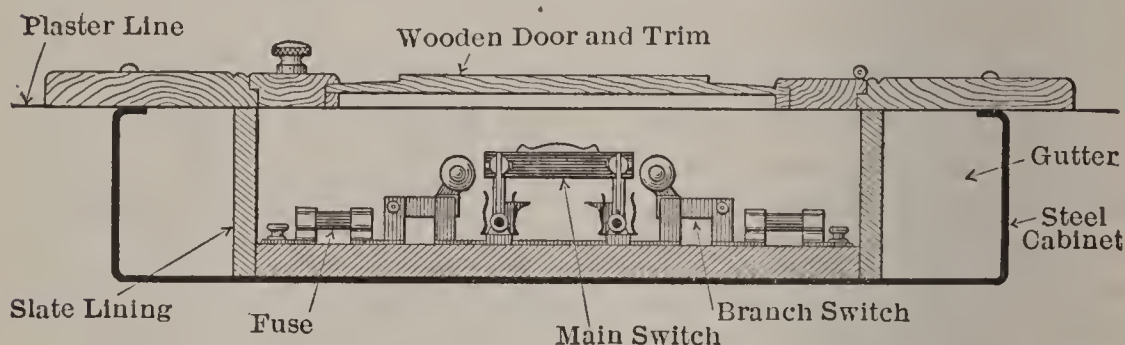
Sectional View of Lighting Panel Board and Cabinet.
